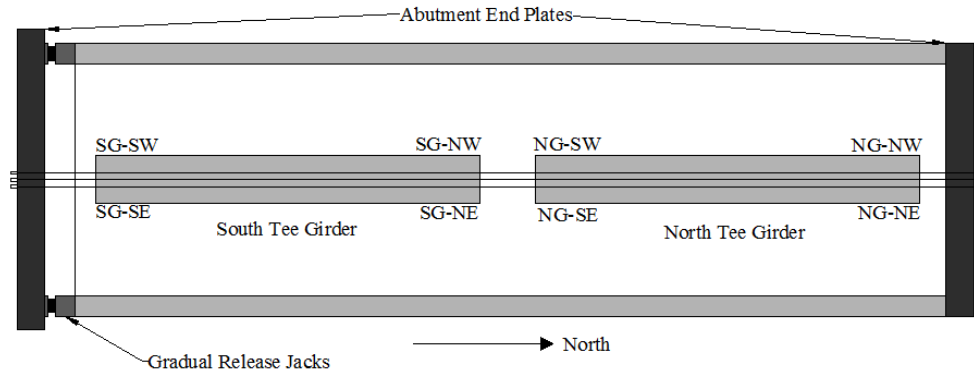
Layout of specimens in the prestressing bed and nomenclature of girder ends
